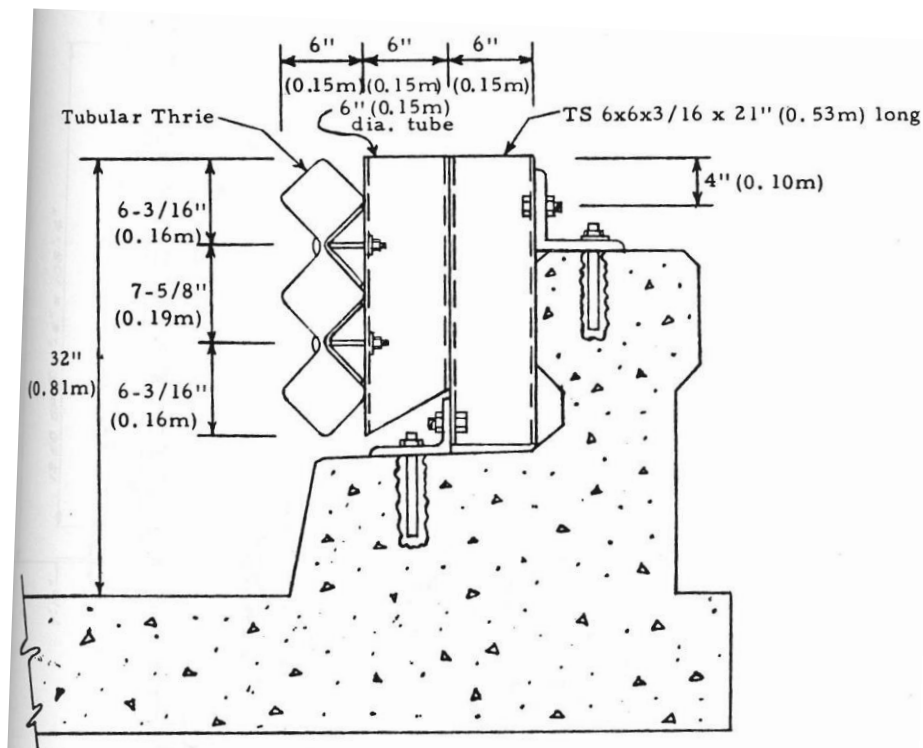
Tubular Thrie Beam on Retrofit Bridge Rail [77]
